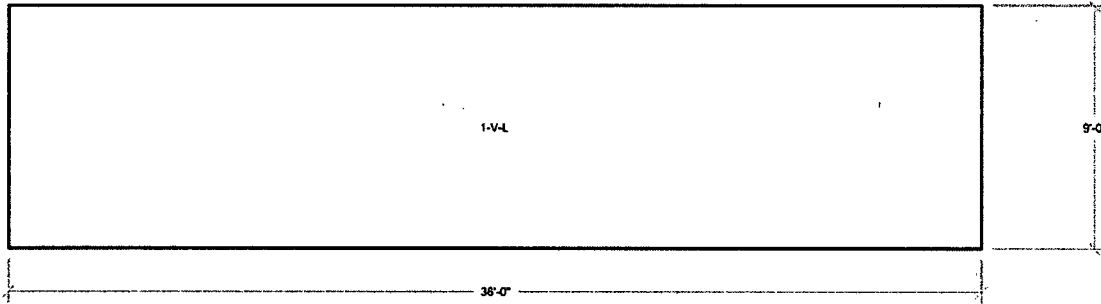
H.7-13: Tunnel Walls Looking From Outside Vertical Reinforcement Zones Near Side Face
